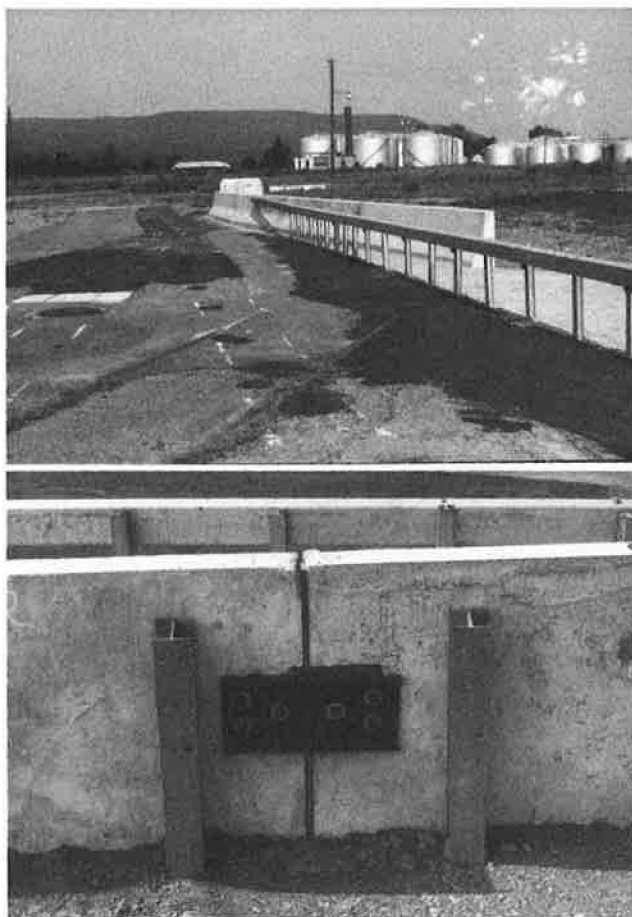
Pier-protection barrier for Tests 60 through 63 (above) included continuity connector and W6x9 backup posts for joint support (below).
